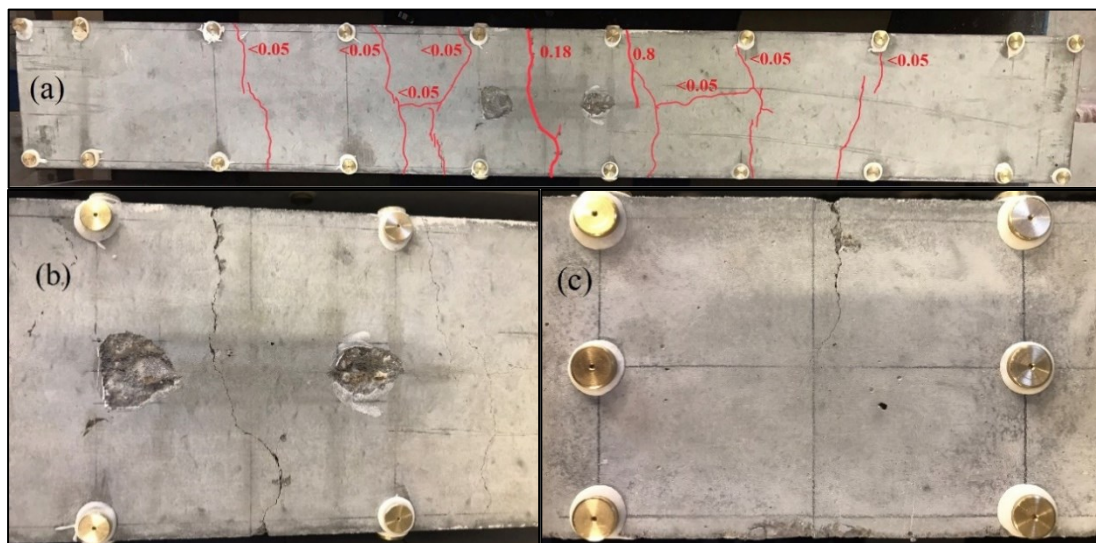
C3 cracks configuration: (a) Mapping, (b) Main crack top view, (c) Main crack lateral view
